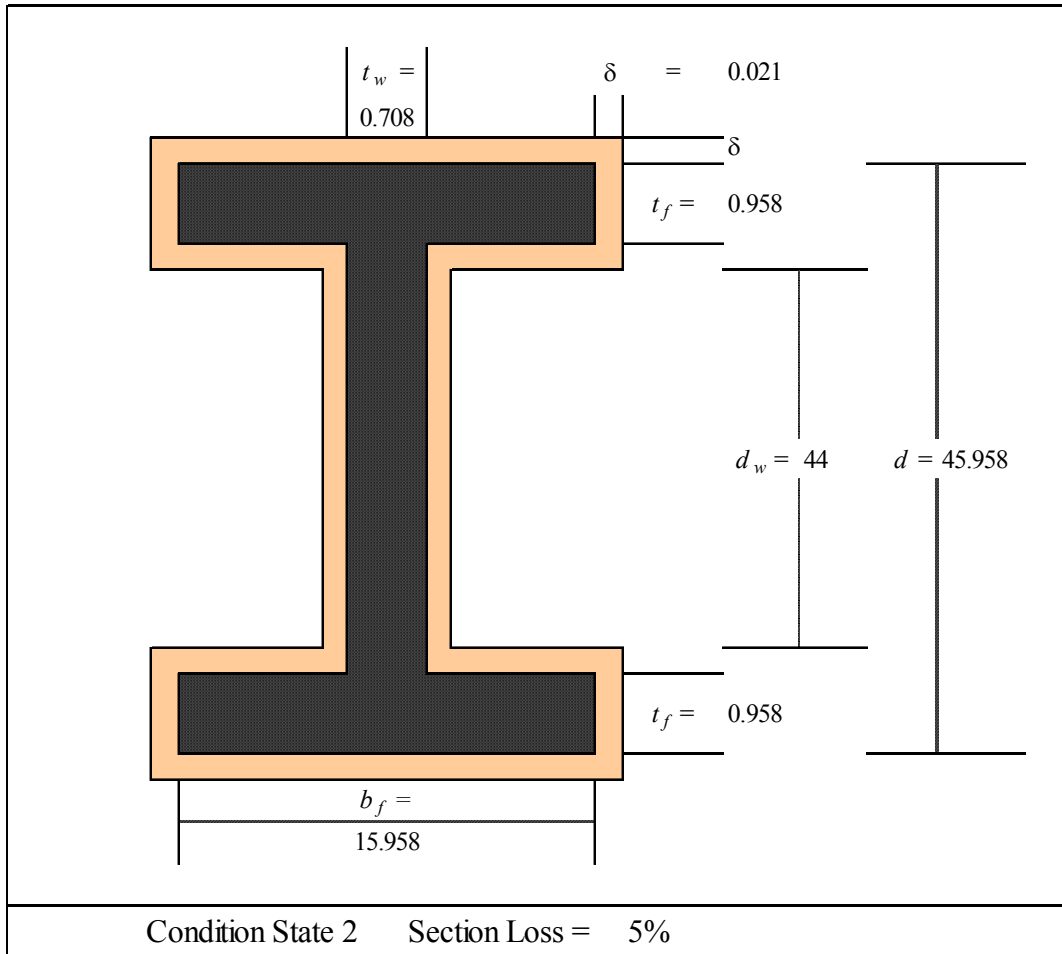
Dimensions of Steel Girder Cross-Section in Condition State 2
